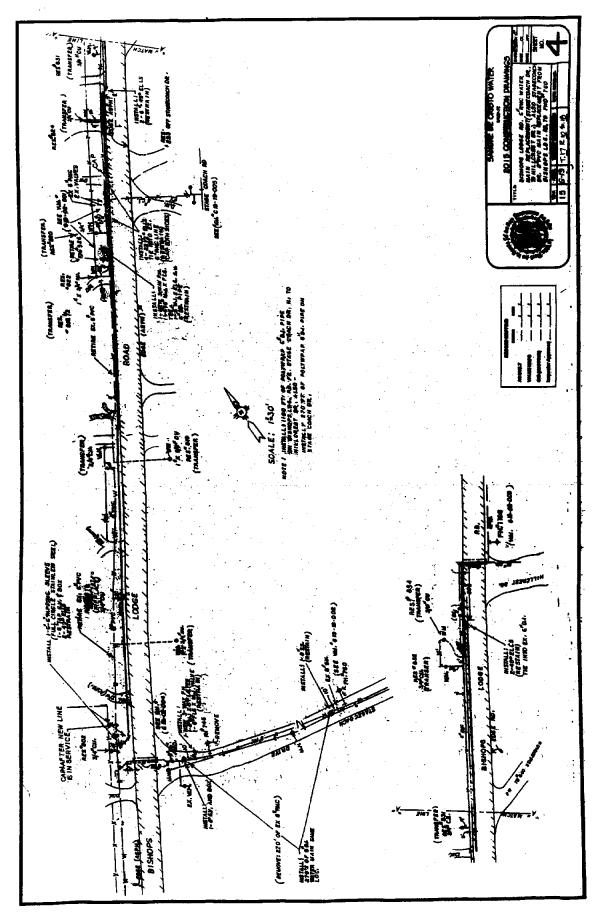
Construction Drawings, Bishop's Lodge Road, Stagecoach Dr. to Hillcrest Dr.
